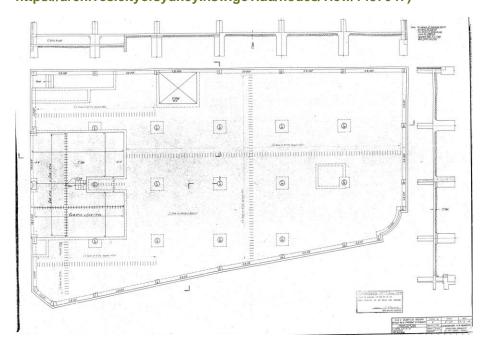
1948 – Ground floor plan and structural details for W & A Gilbey Ltd Factory, by C. Orme, architect, and A. S. Nicholson & H. R. Hammond, consulting engineers, approved 18 June 1948 (Source: City of Sydney Archives, Pyrmont Bridge Rd NW cnr & Pyrmont St (adjacent No 135), new building (01/01/1947 - 31/12/1947), [A-00572010]. https://archives.cityofsydney.nsw.gov.au/nodes/view/1437047)
